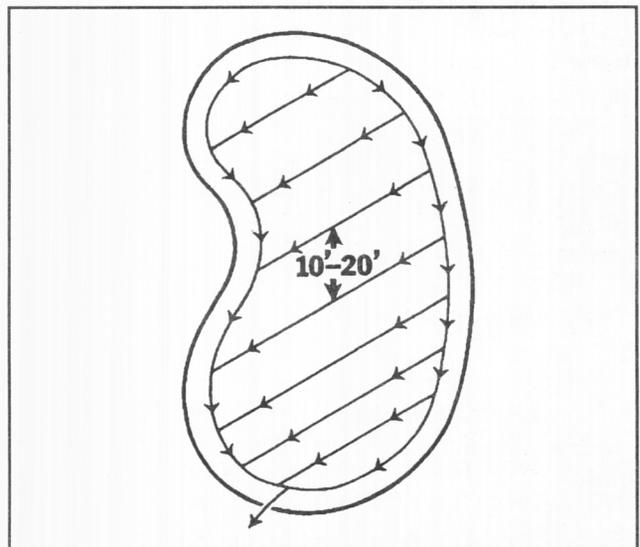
Typical pattern for drainage tile installation in golf greens so that water will not have to travel in excess of 10 feet and the recommended "ringing" a green with drainage line when slopes are greater than 2 percent or surface water runoff from higher surrounding ground occurs across the green's surface.
